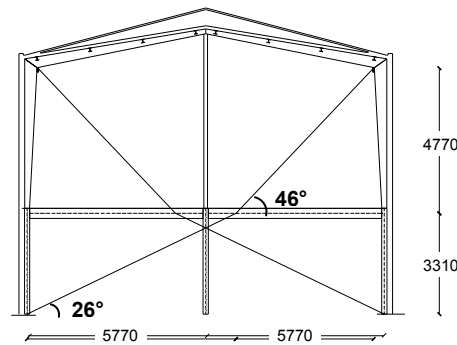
Cable Layout for CYG1 and CYG2 Alignments in the Gym Building
